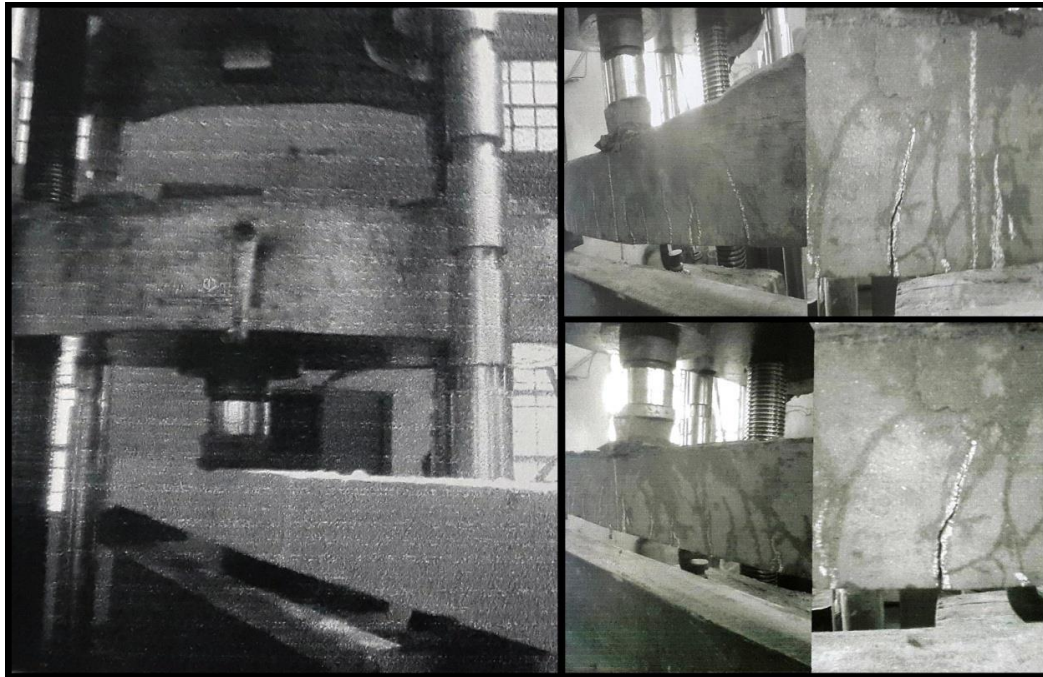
Experimental Setup and Testing Arrangement of Specimens
